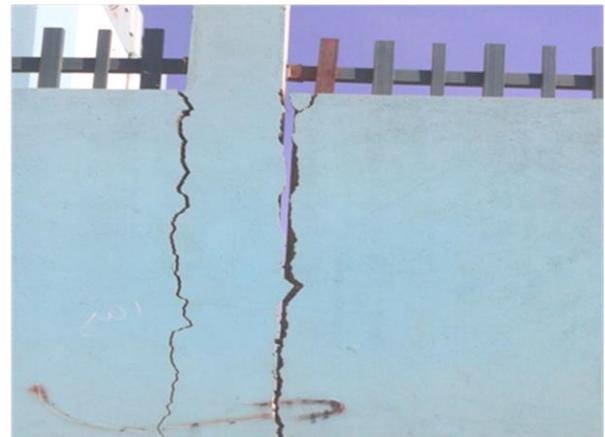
Sever vertical cracks appeared at the joint between column and masonry wall of the fence
